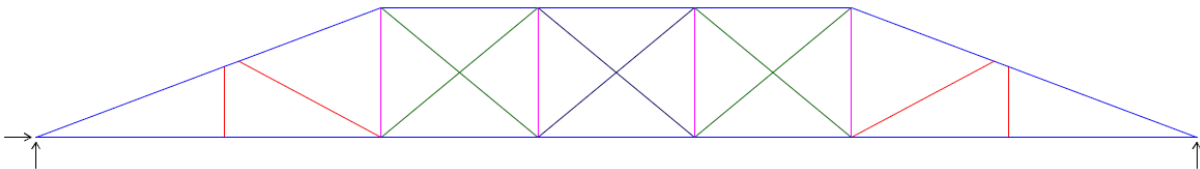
Model Showing Support Conditions for Single Truss Analysis (Old PWD Truss)
